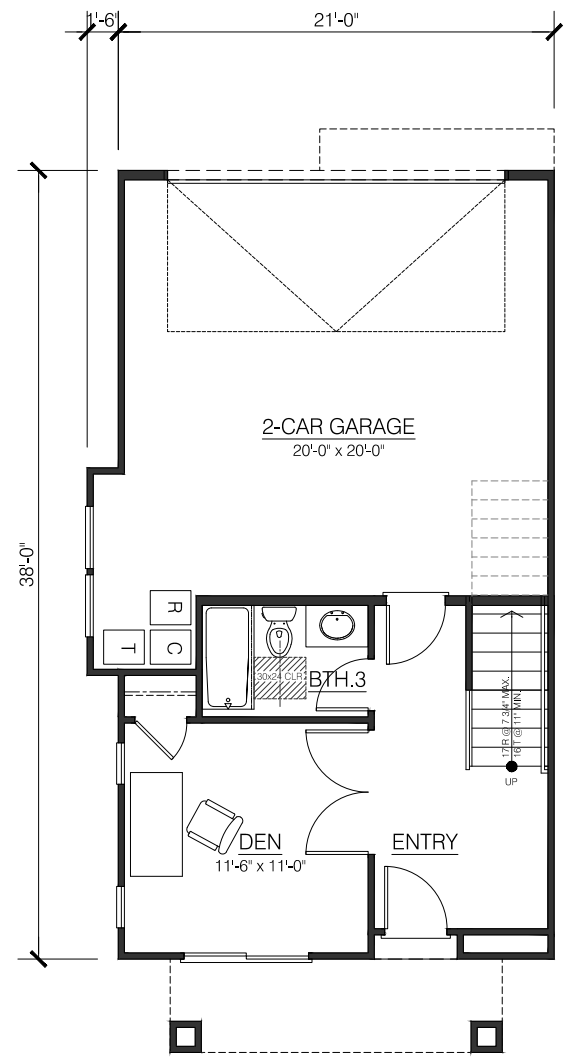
PLAN 1.1 ALL FLOORS
